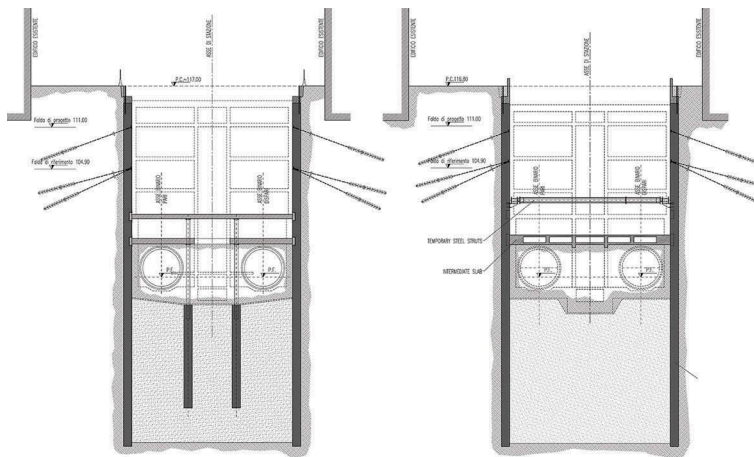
Dateo Station – Excavation sections and retaining structures – Solution “B1” (left) vs. Solution “B2” (right).
